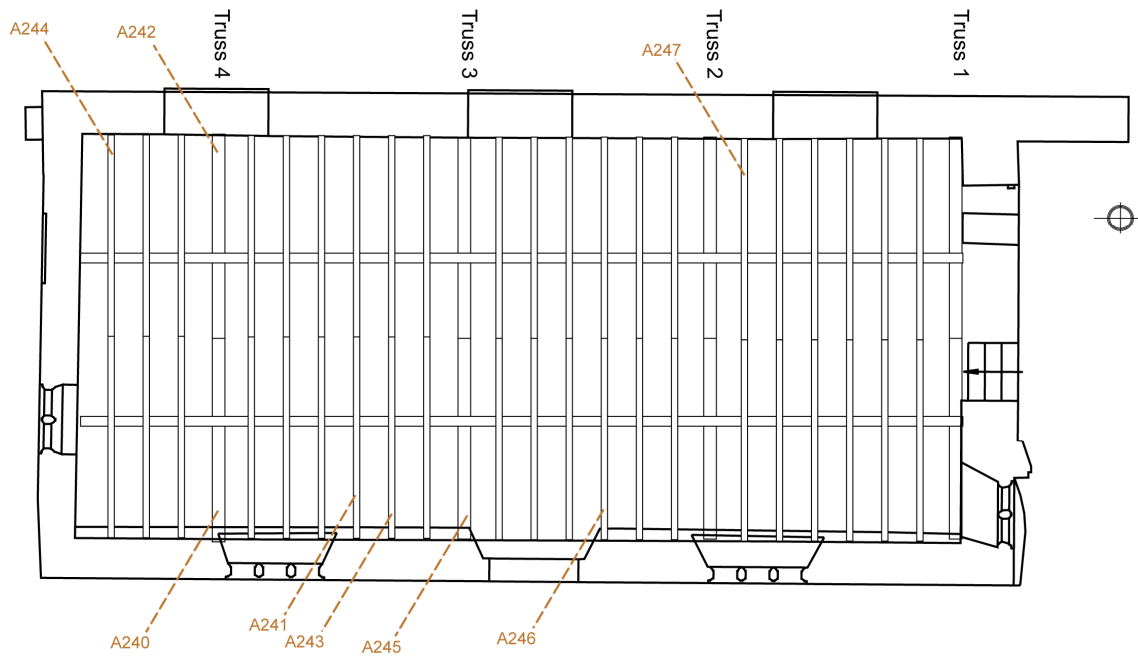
Roof plan, south-west stable, showing the locations of samples APT-A240–7
